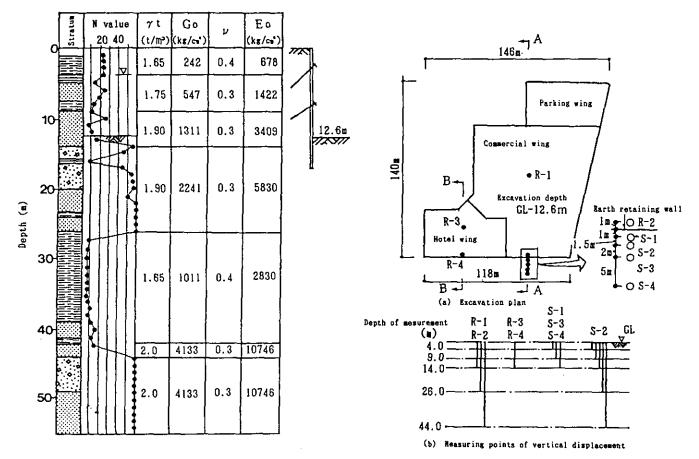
Ground condition and the excavation site Fig. 10. : Excavation plan and the measuring points -134 -
